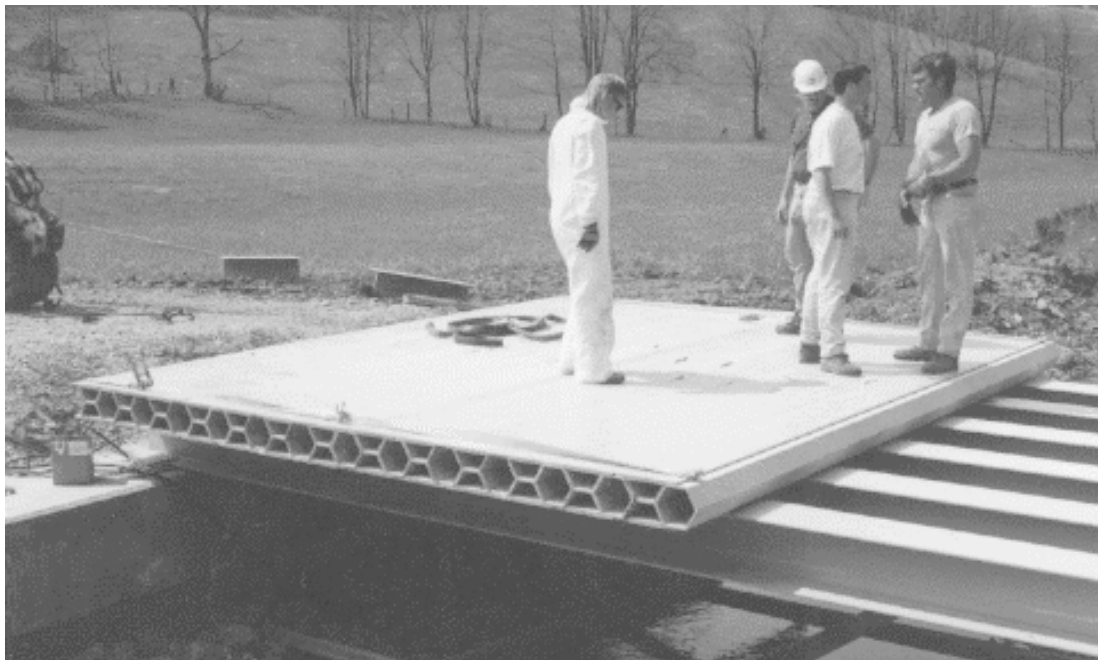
Placement of H-Deck sections on FRP stringers for Laurel Lick Bridge.
